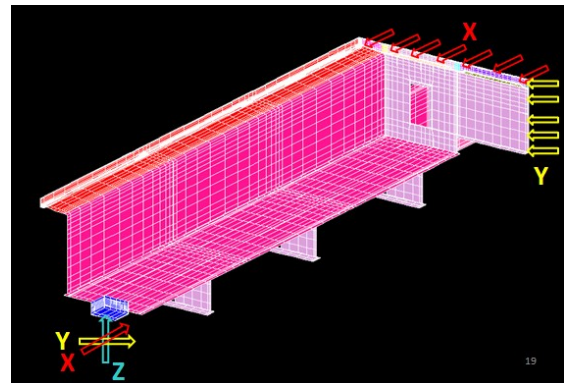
(b) Structural boundary condition of the 1/4th single span FEM bridge model
